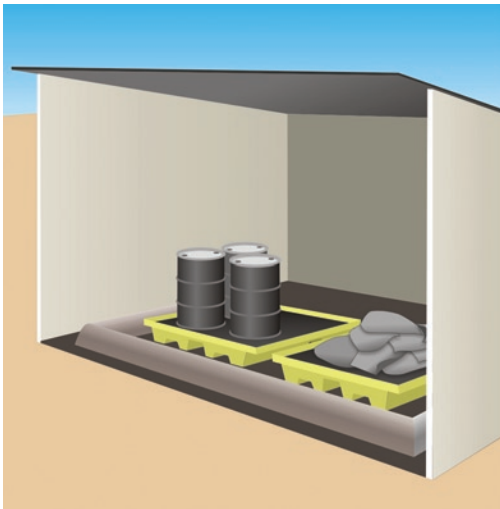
Illustration showing construction materials with secondary containment and overhead cover to prevent stormwater contamination.
